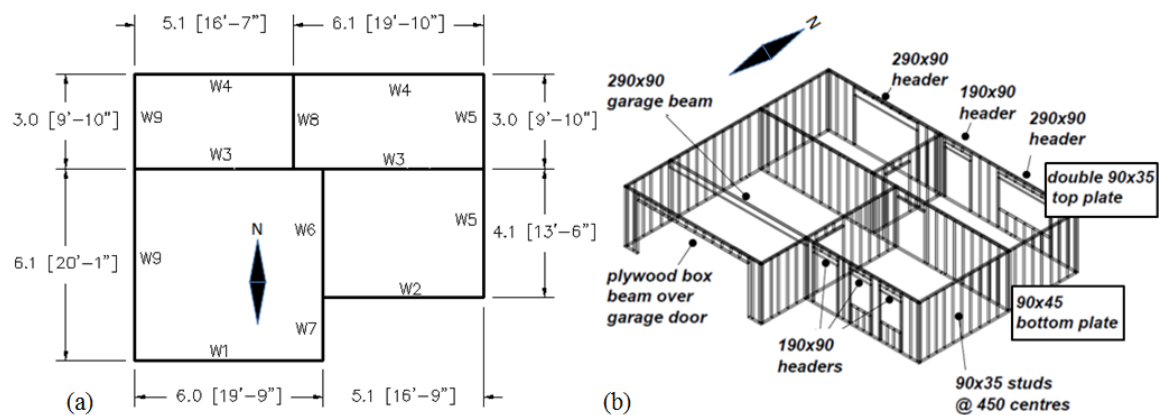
(a) Floor Plan with Centerline Dimensions [m (ft-in)] and Wall Designation, (b) Wall framing (mm) (Paevere 2002)
